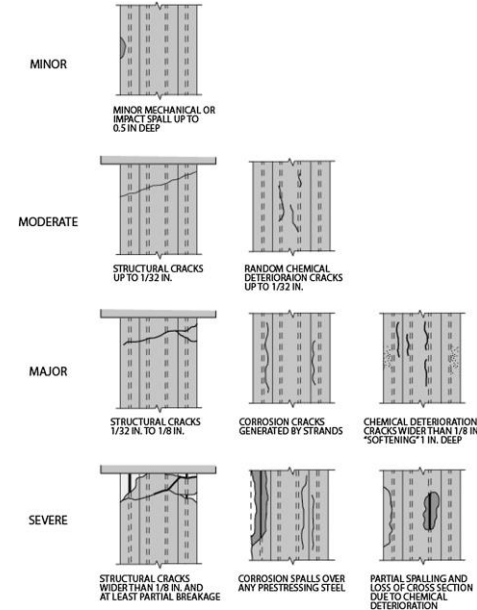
Damage ratings for prestressed concrete elements
